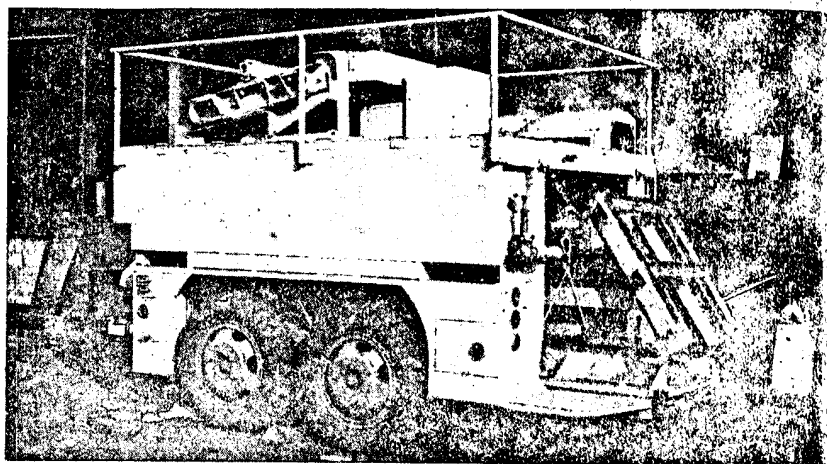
Side view of one of types of horizontal earth boring machines used by Con Ed. This compact, self-contained unit using an Army searchlight trailer chassis.
